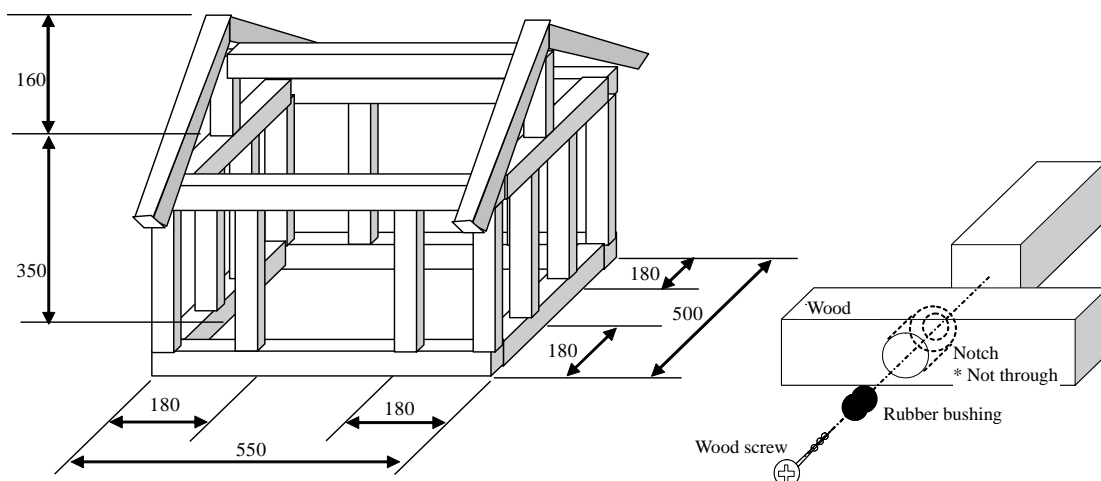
Appearance and dimensions of the single-story building model of Hand Cart BURURU (left) and enlarged view of a joint
